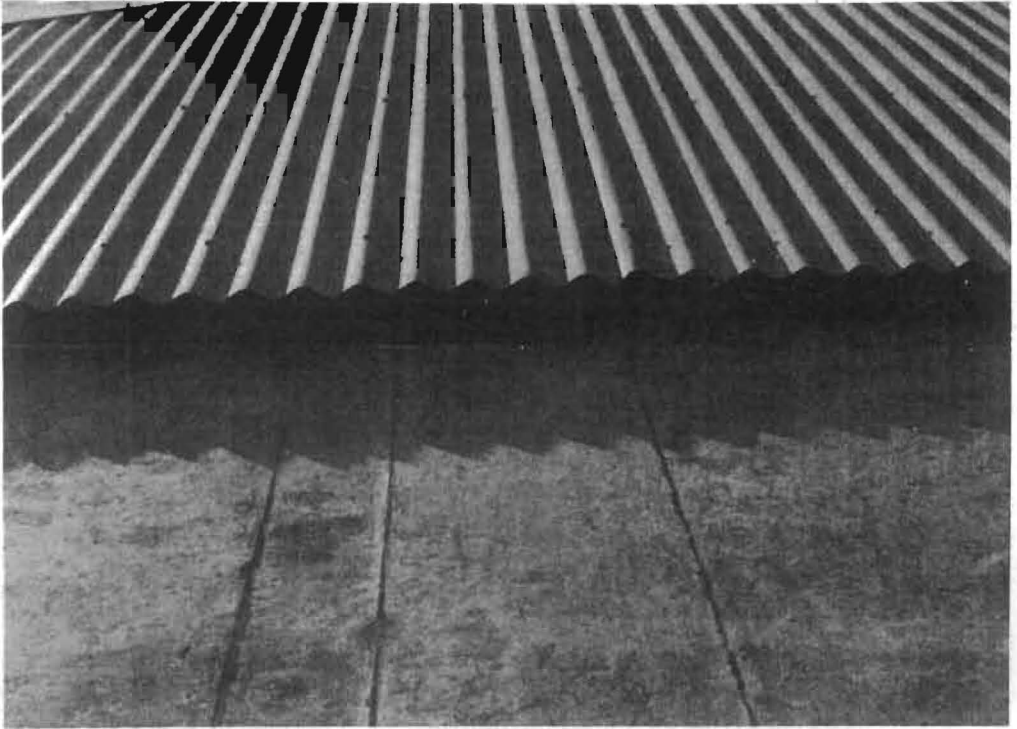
The region of the gable end where the wall cladding overhangs the top of the concrete wall. Viewed from below.
